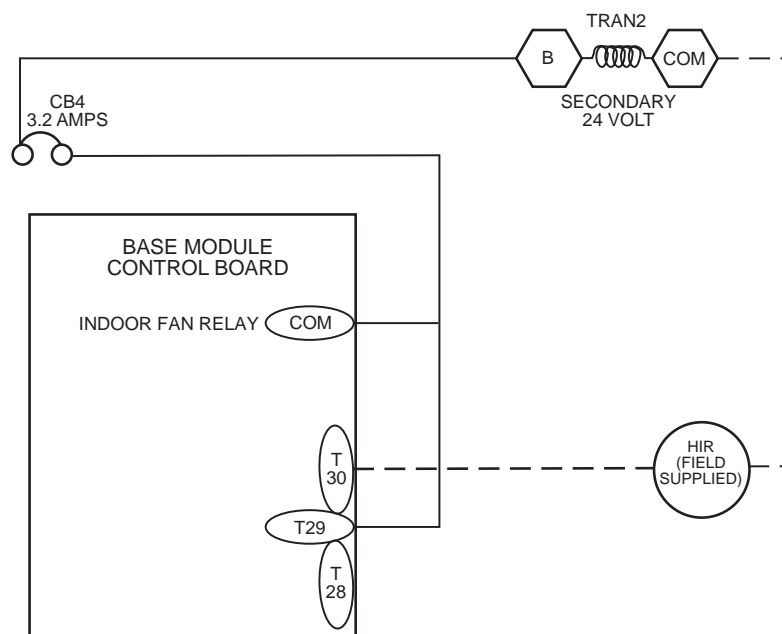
Heat Interlock Relay Wiring (Part No. HN61KK040)
